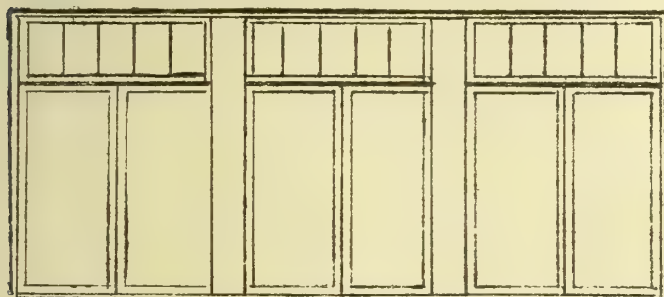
TYPICAL SCHOOLHOUSE WINDOWS
